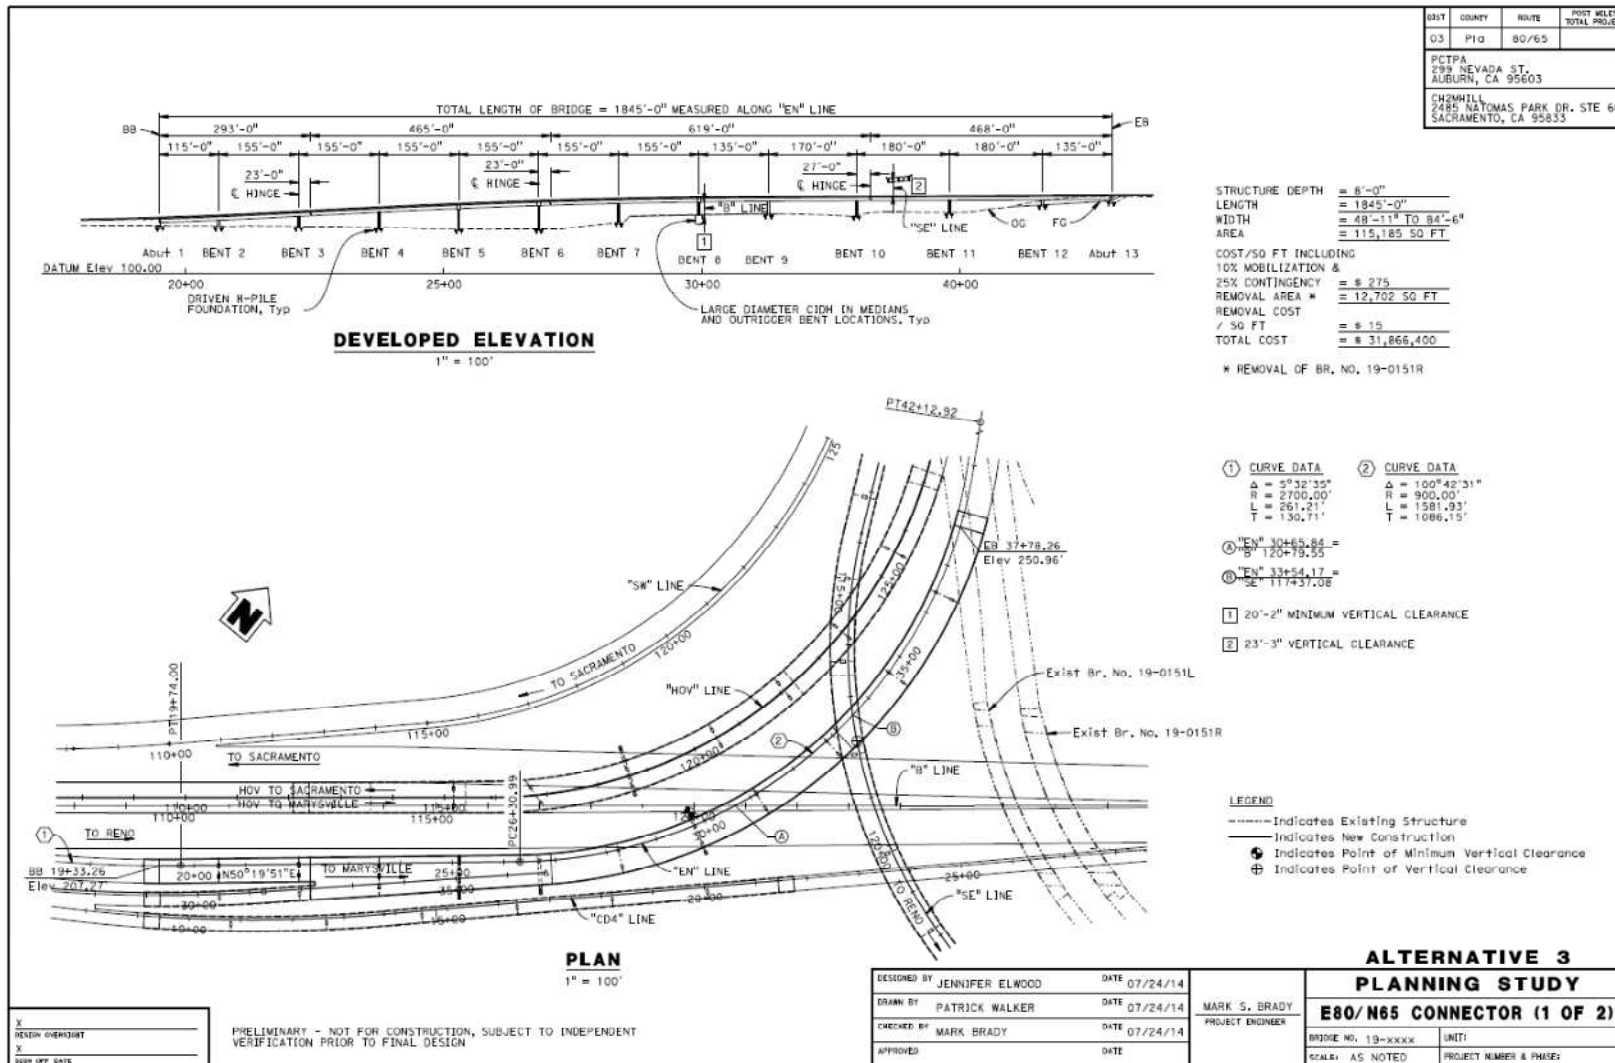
Proposed EN Connector Plan (Alternative 3) (1 of 2)
